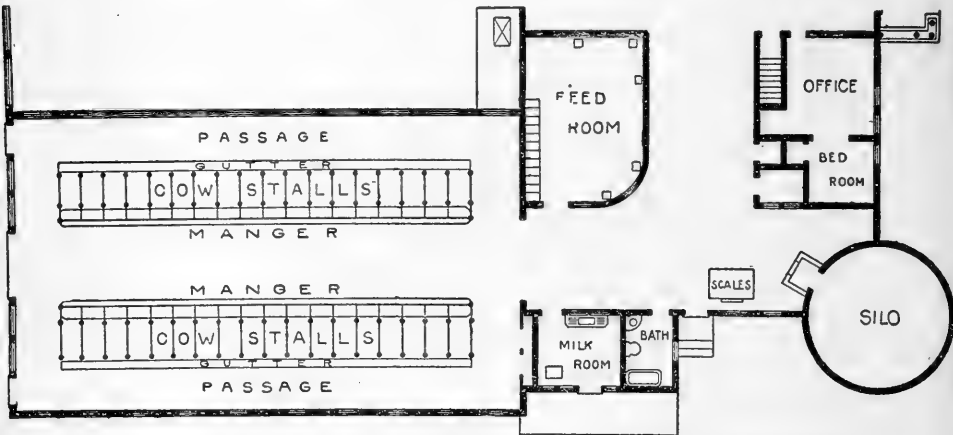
PLAN OF EASTERN HALF OF FIRST FLOOR OF DAIRY BARN, WISCONSIN EXPERIMENT STATION.
